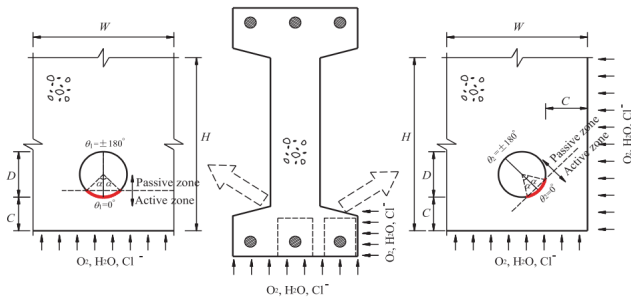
Model for chloride infiltration into reinforced concrete section(Chen, 2019)
